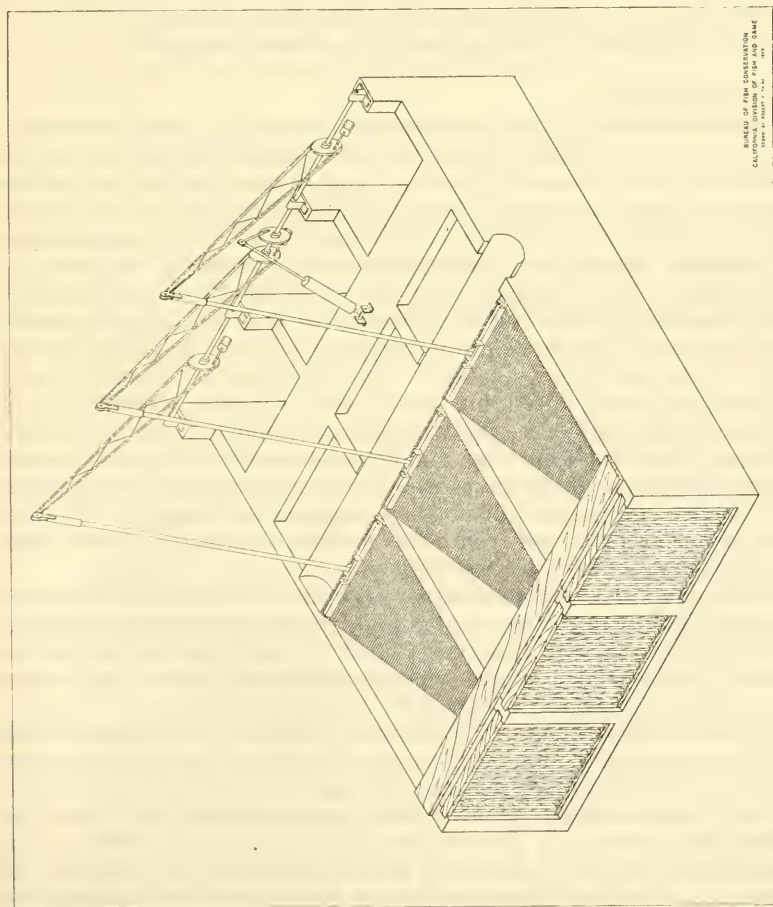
View of perforated plate fish screen operated by hydraulic cylinder. Drive assembly is much simplified in the drawing. Motor and pump are not shown
